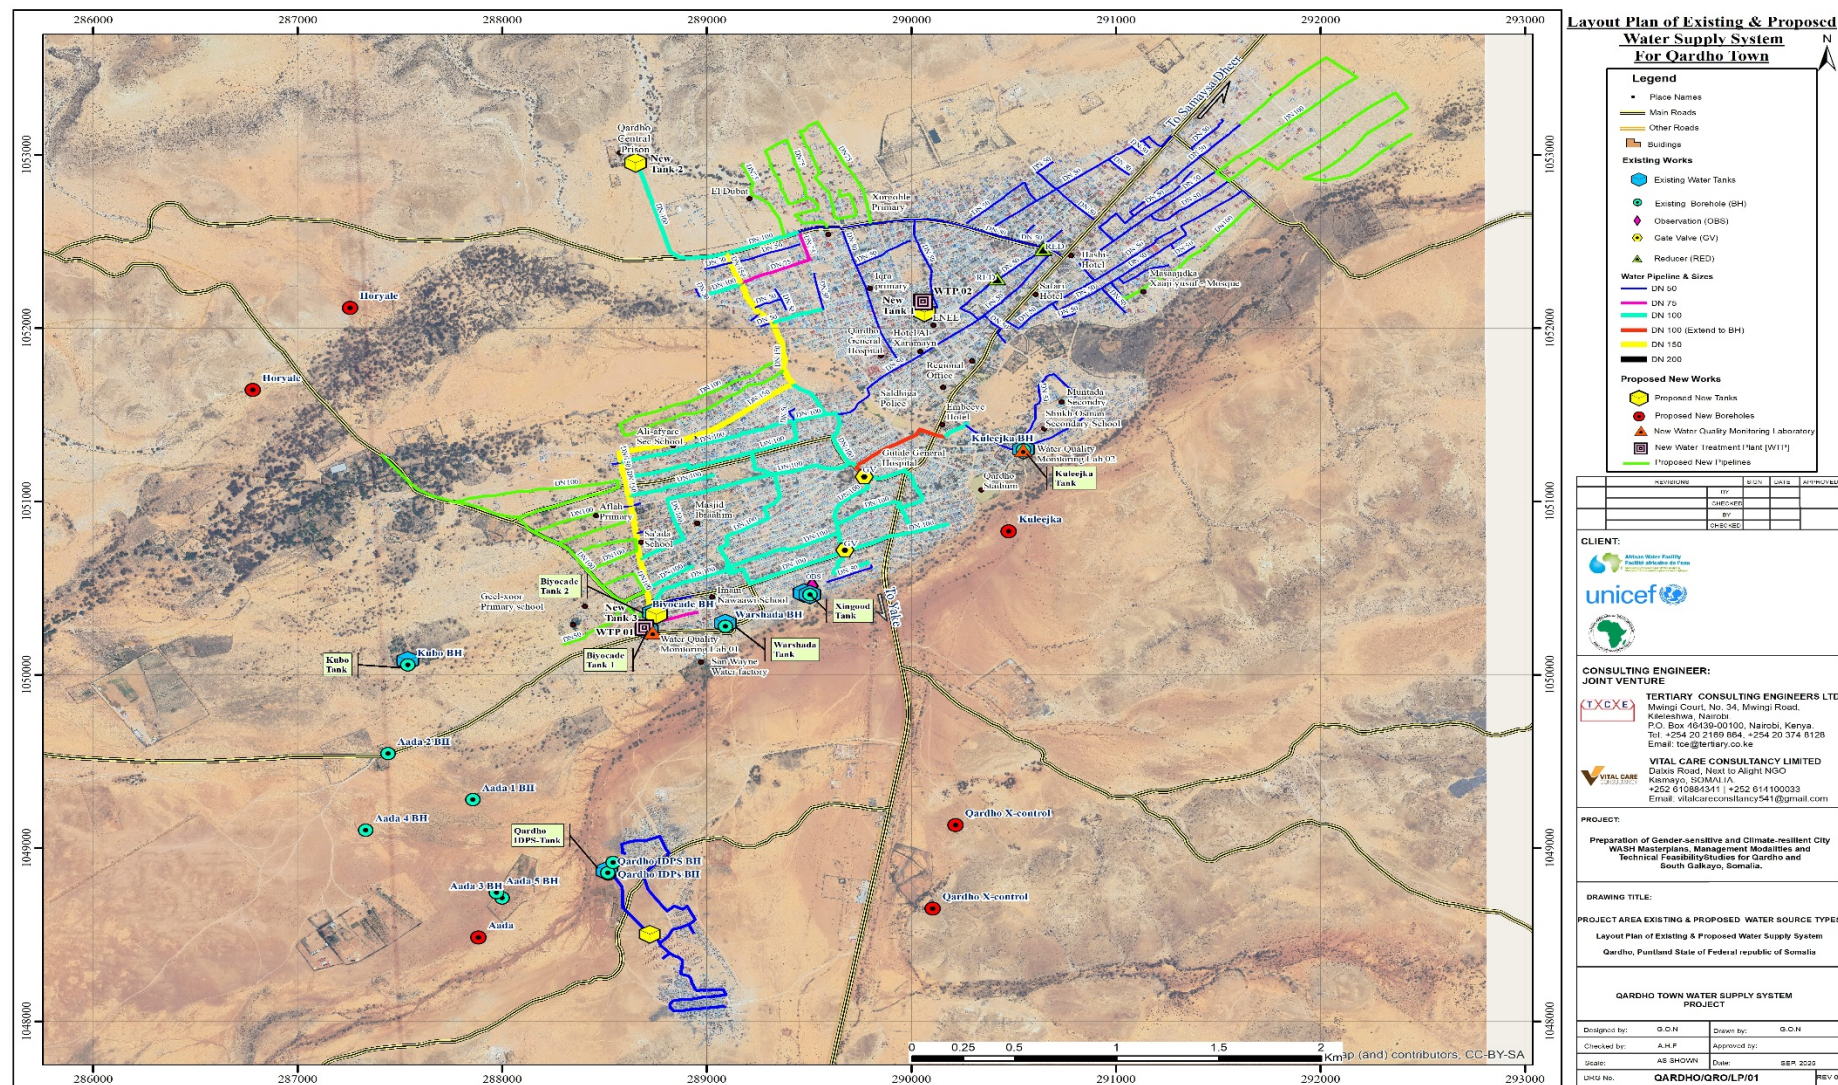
Layout Plan of the Project Area with the Existing and Proposed Water Networks in Qardho
